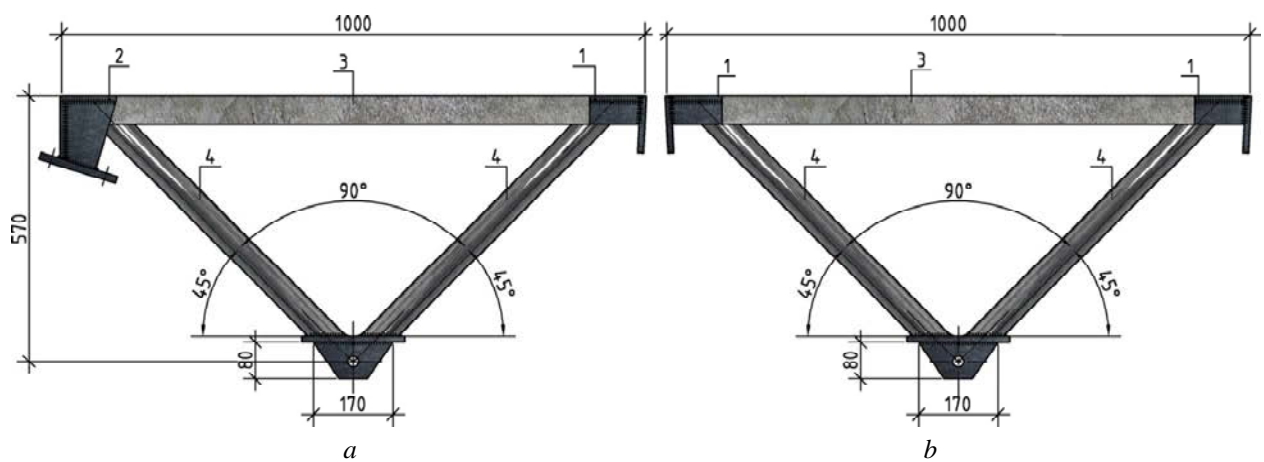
The supporting (a) and span (b) spatial modules of the spatial grid-cable steel-concrete composite slab:
